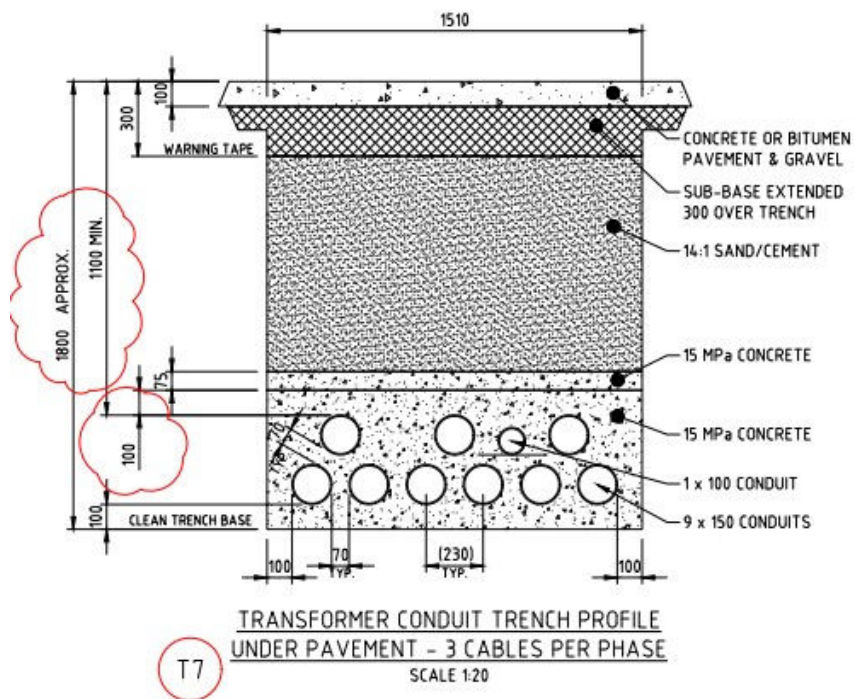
132kV Cable Trenching Arrangement Used In Model
